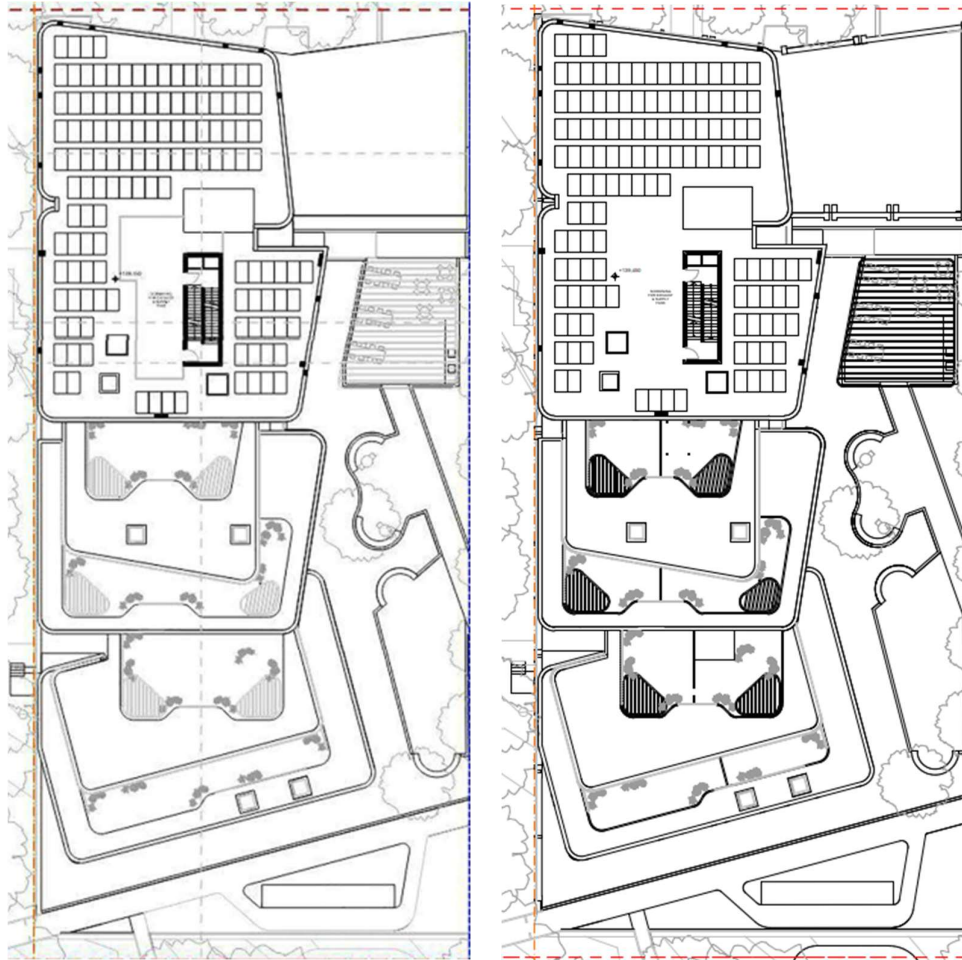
Approved and Proposed Roof Level of Building D (1 of 2)
